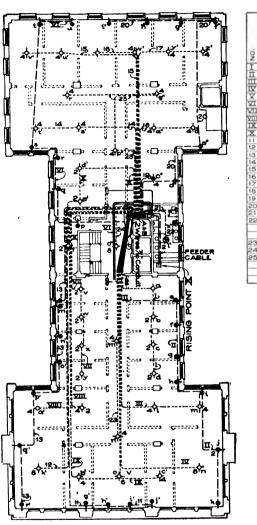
Wiring of an Office Building. Plan of Second Floor. Rear Portion Occupied as a Composing and Linotype Room.
